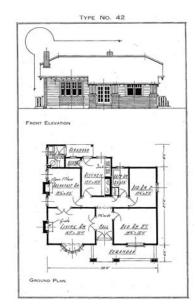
State Savings Bank Type T42 Design used for the dwelling at 49 Edols Street, Ballan. Source: G. Burridge Leith, 'Type T42' Cottage Design. Source: The State Savings Bank of Victoria Design Book: Timber-Framed Dwellings Containing 56 Standard Types, March 1929, VPRS8933/P0437, Units 2 and 3, PROV.
